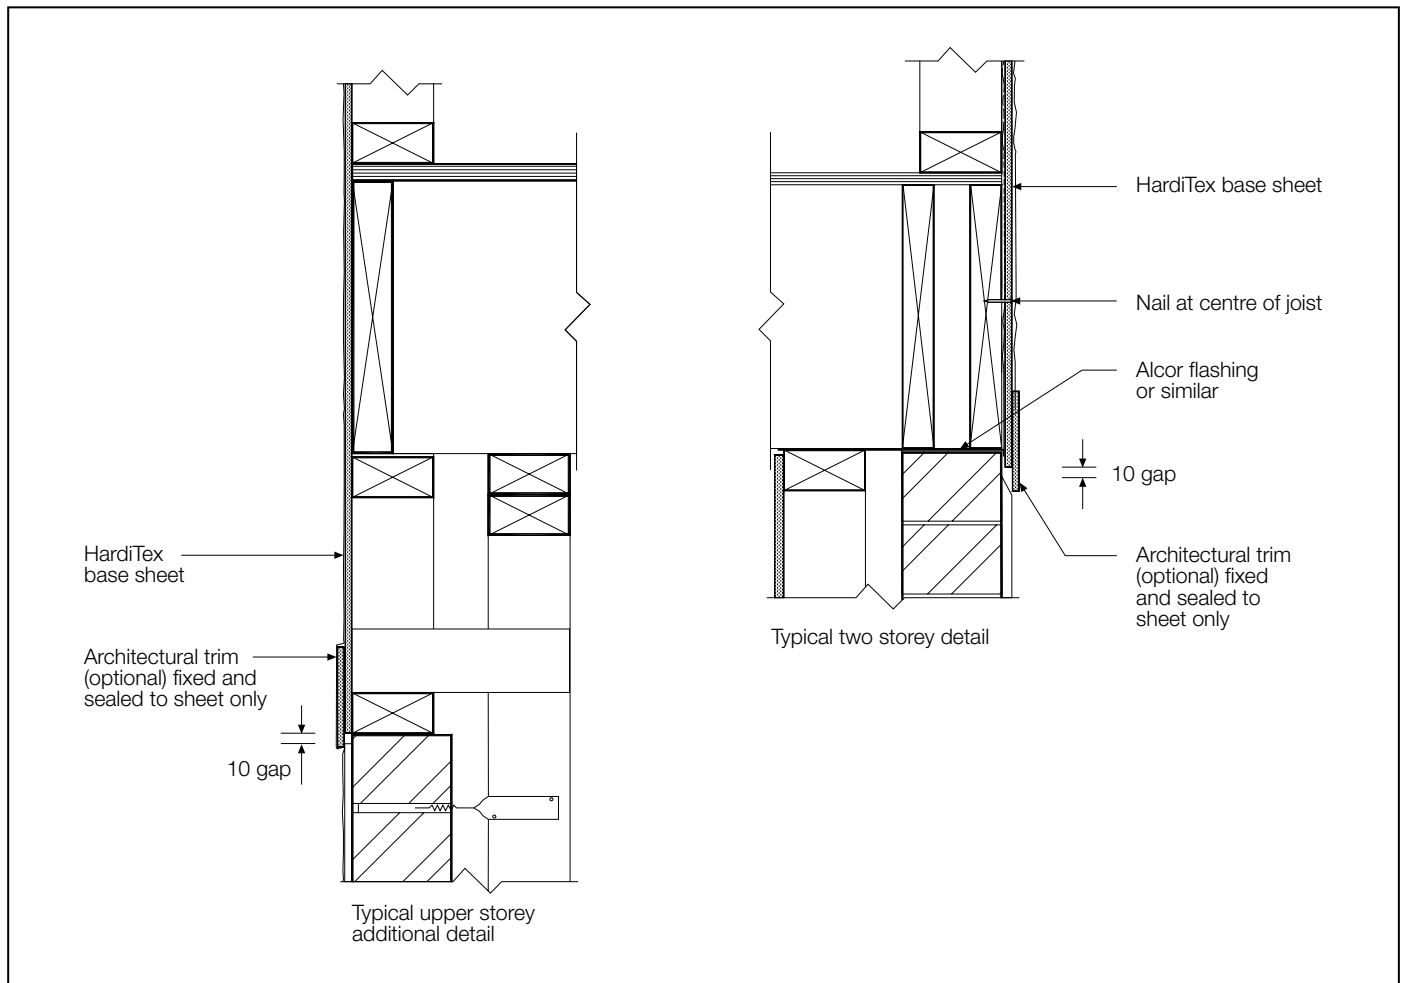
HORIZONTAL MOVEMENT JOINT - FLOOR JUNCTION WITH MASONRY GROUND FLOOR
